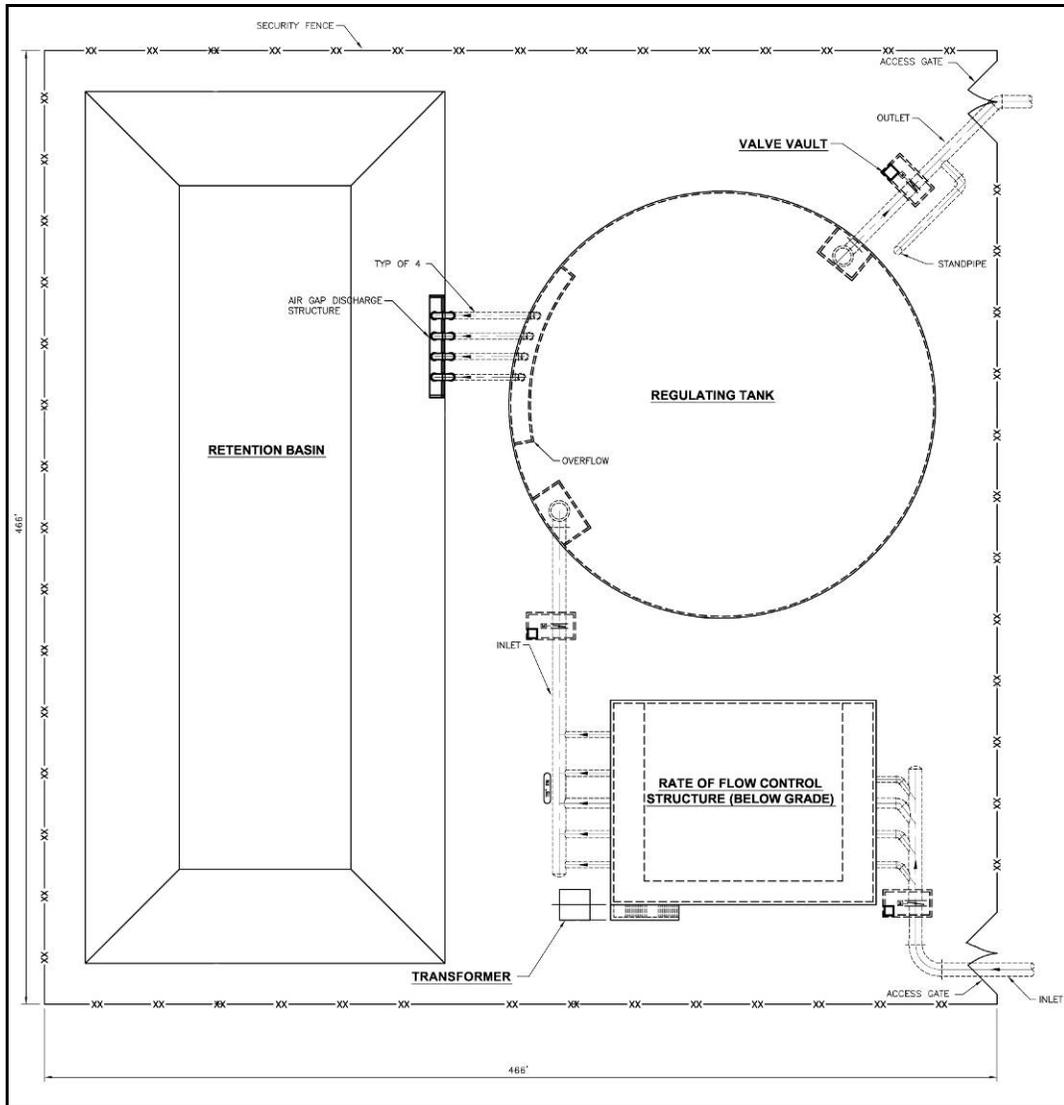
Preliminary 5-Acre Regulating Tank Site Plan
